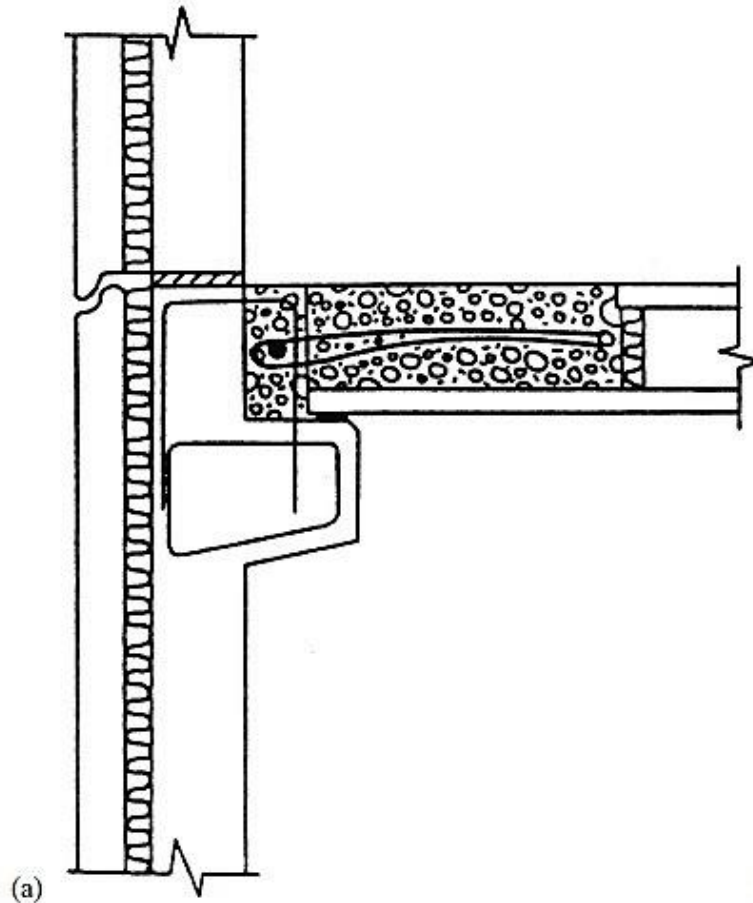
Continuous connections in floor slab to external wall joints: (a) using U-shape site bars and (b) using projecting L-shape bars.
